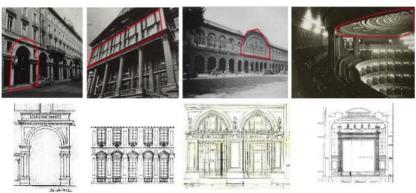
Outdoor and Indoor Architectural Elements Source: He and Raygoza
